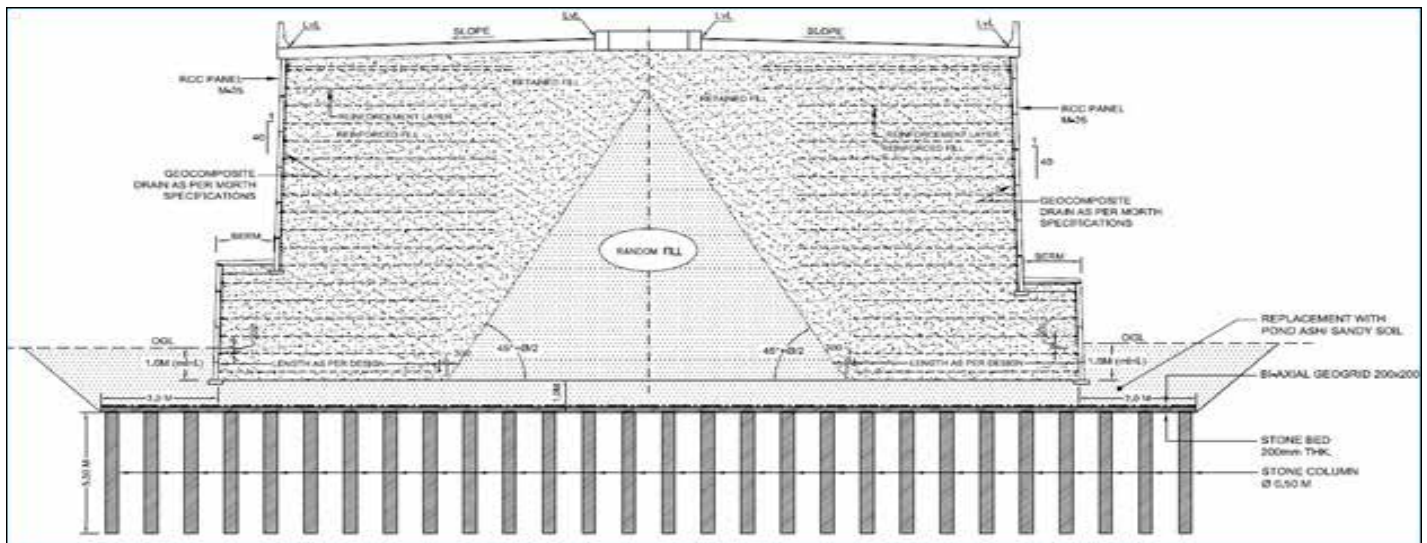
Ground improvement by Stone column 500 dia 5.0 m long proposed to sustain 26 m high RE-wall embankment
